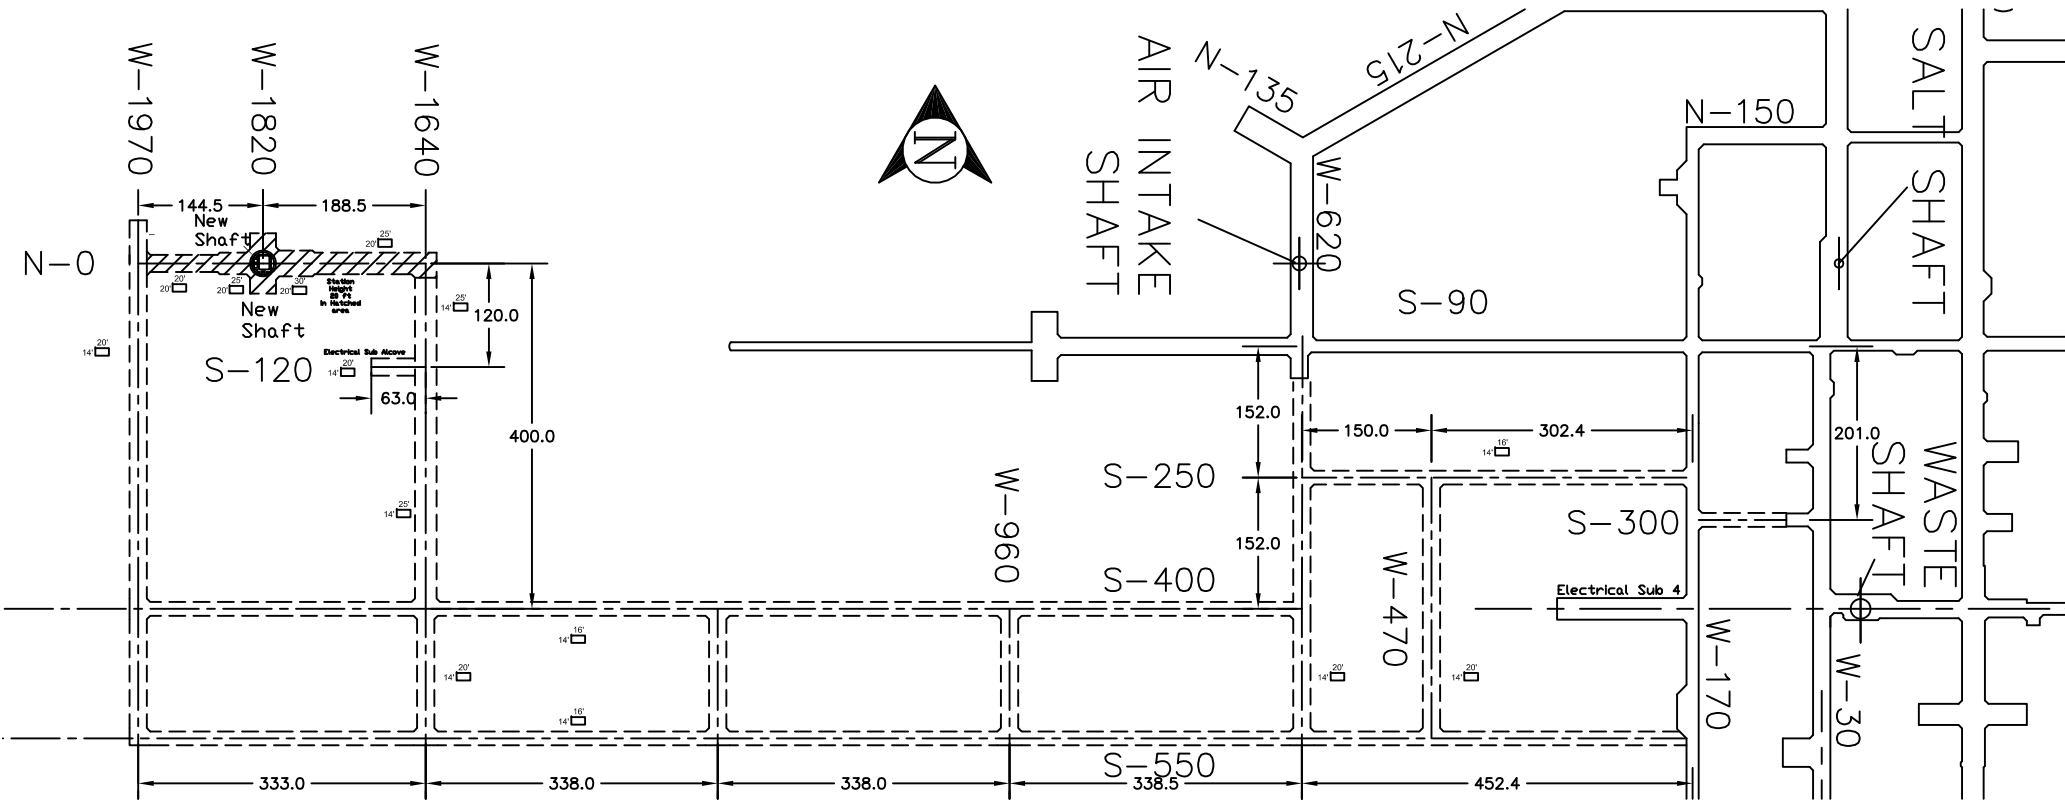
Proposed Underground Location of New Shaft and Connecting Drifts
